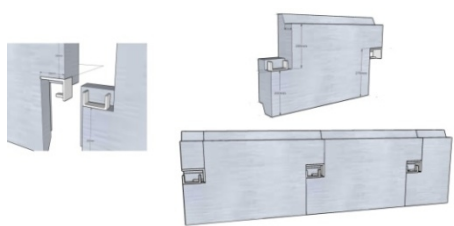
Frame elements section scheme in the first floor and general 3D view of the model
